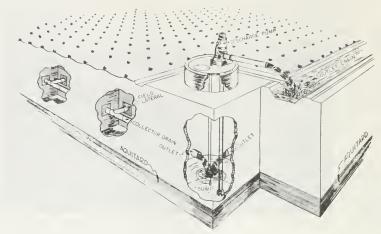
TYPICAL TILE DRAINAGE SYSTEM WEST SIDE OF THE SAN JOAQUIN VALLEY
